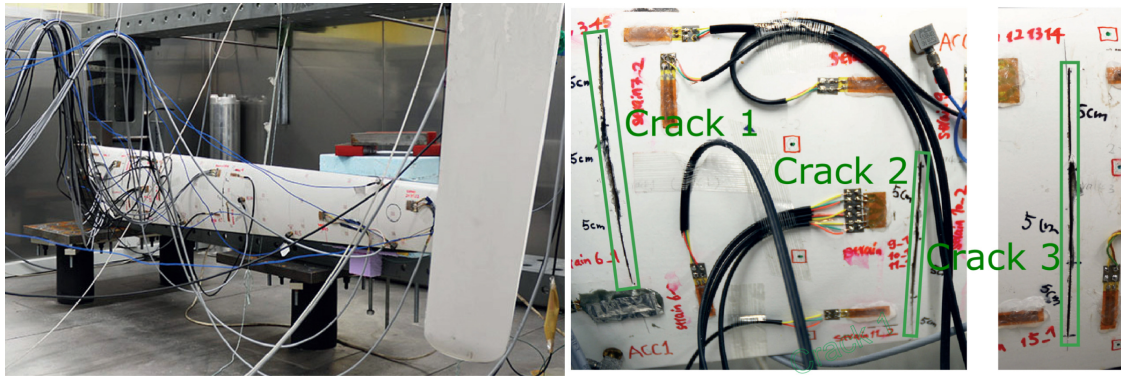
Left: Laboratory configuration, Right: Crack damages. (image credits: Ou, et al. from [61]).
